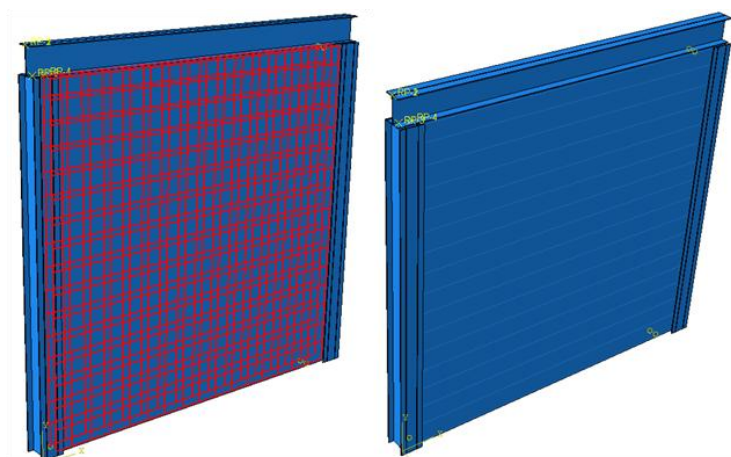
Assembled concrete shear wall (15 cm) within steel frame.
